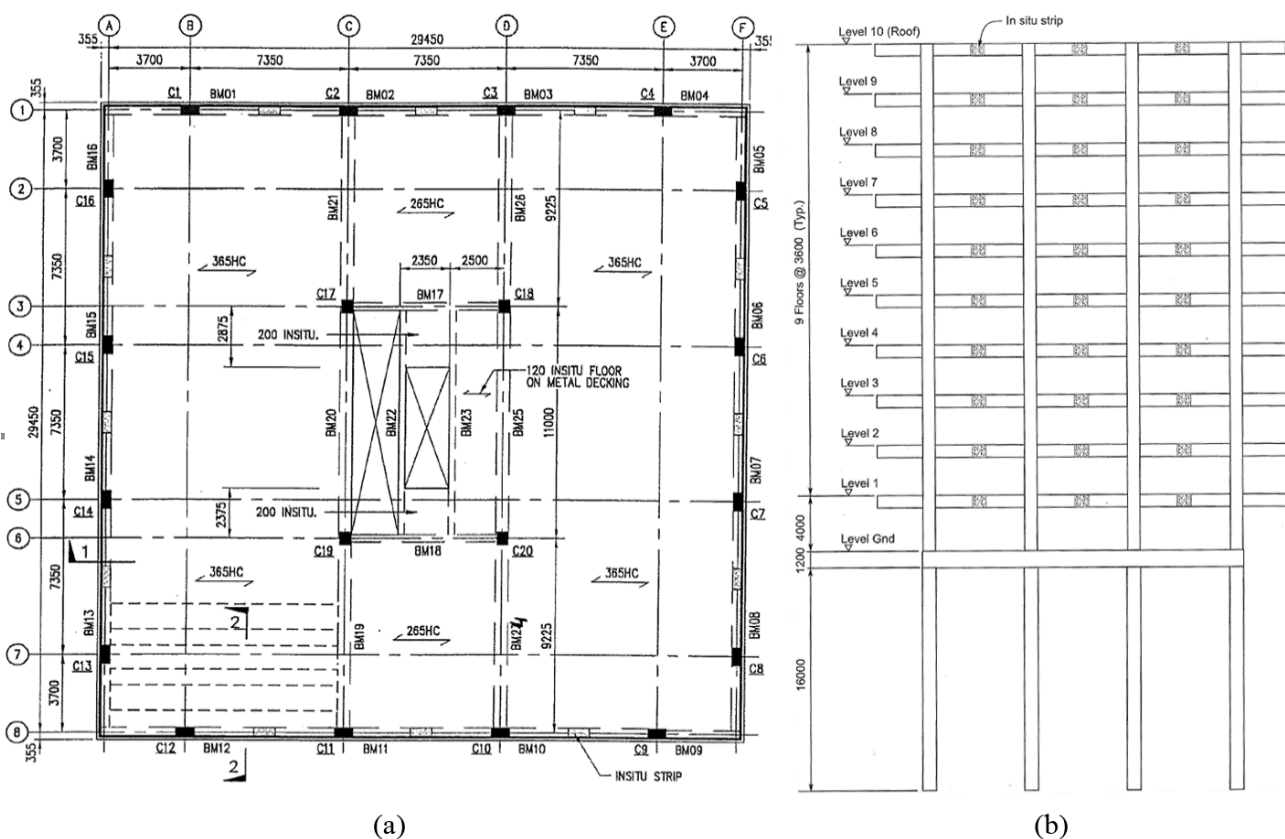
Red Book Building: (a) plan and (b) elevation [18]
